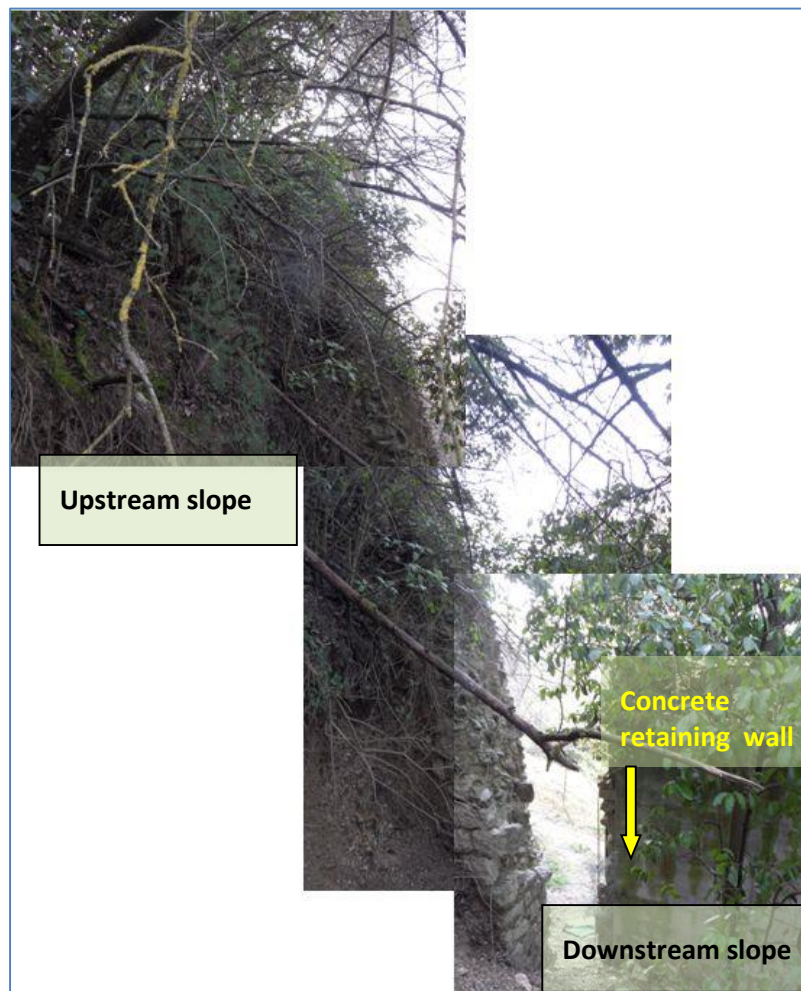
town walls – below zone 1: soil level difference upstream-downstream
